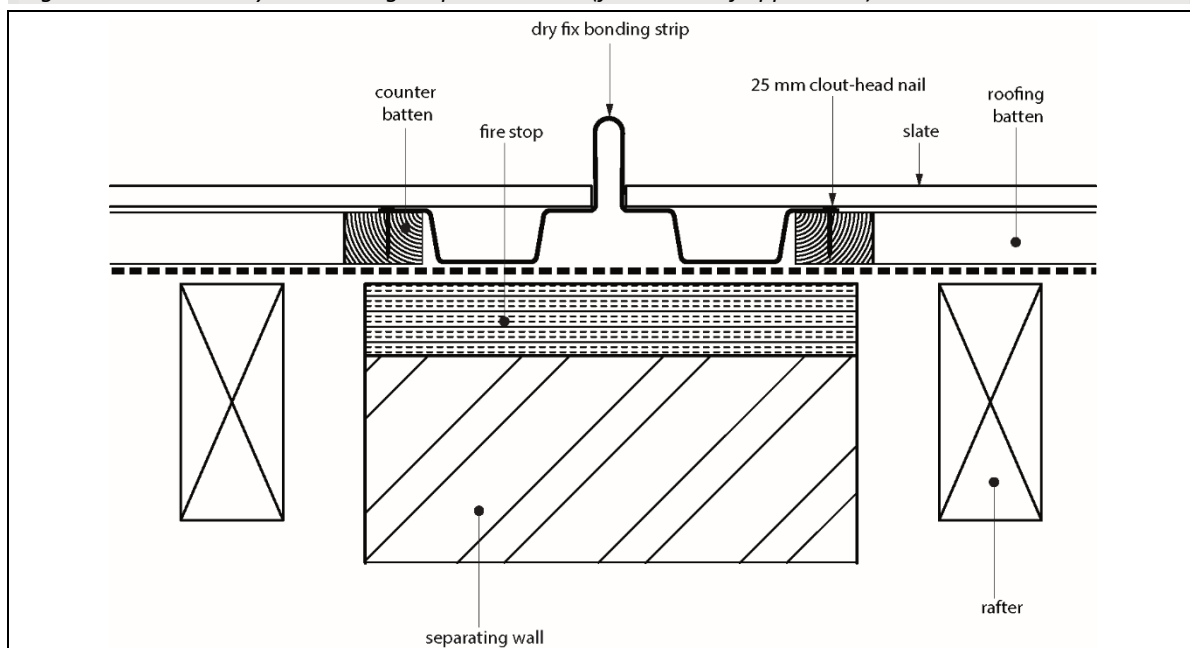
Filon GRP Dry Fix Bonding Strip – GDFBS 110 (for tile roof application)
